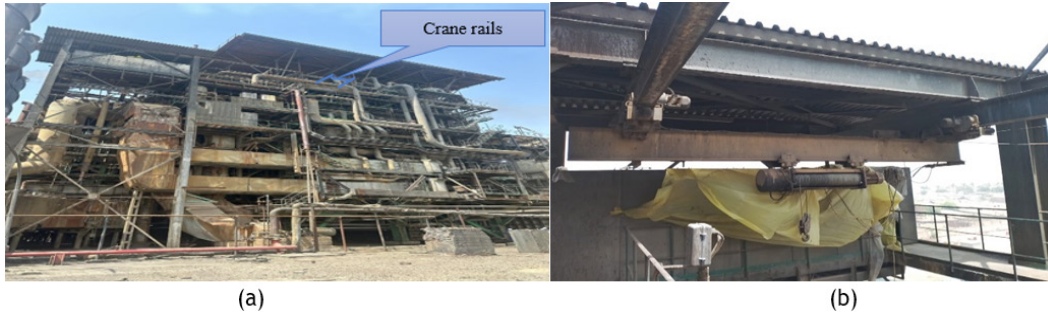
(a) Overhead Single Girder Crane in Power Plant. (b) Crane location in the steam boiler for the power plant
